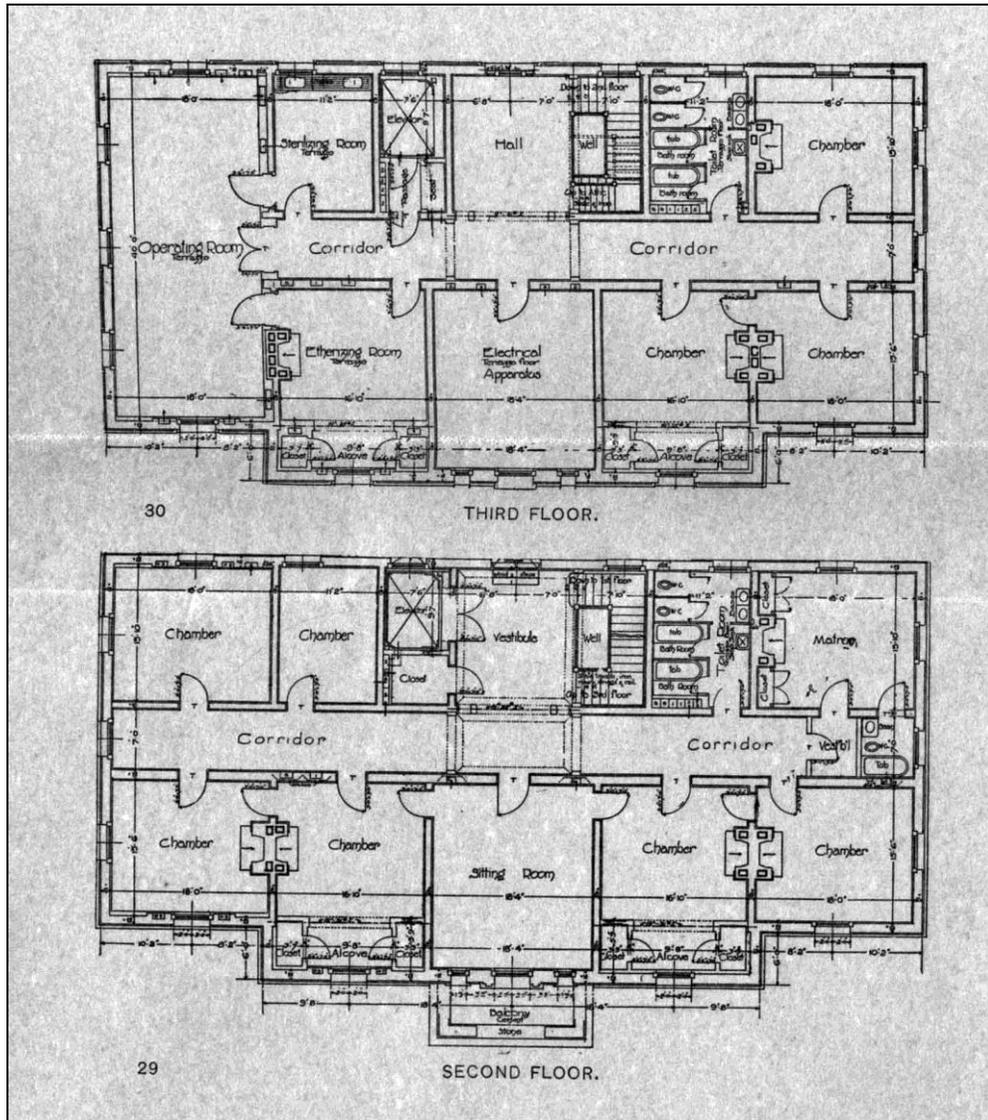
Second and Third Floor Plans, Mountain Branch Hospital Administration Building
